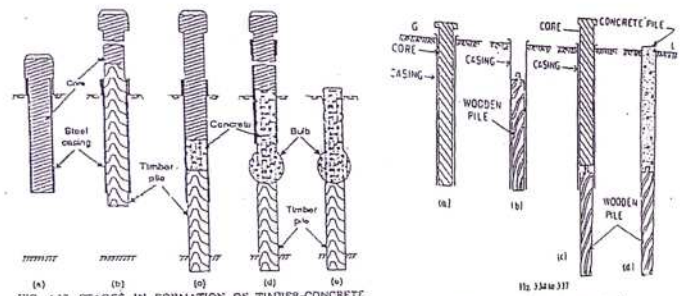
STAGES IN FORMATION OF TIMBER-CONCRETE COMPOSITE PILE.
